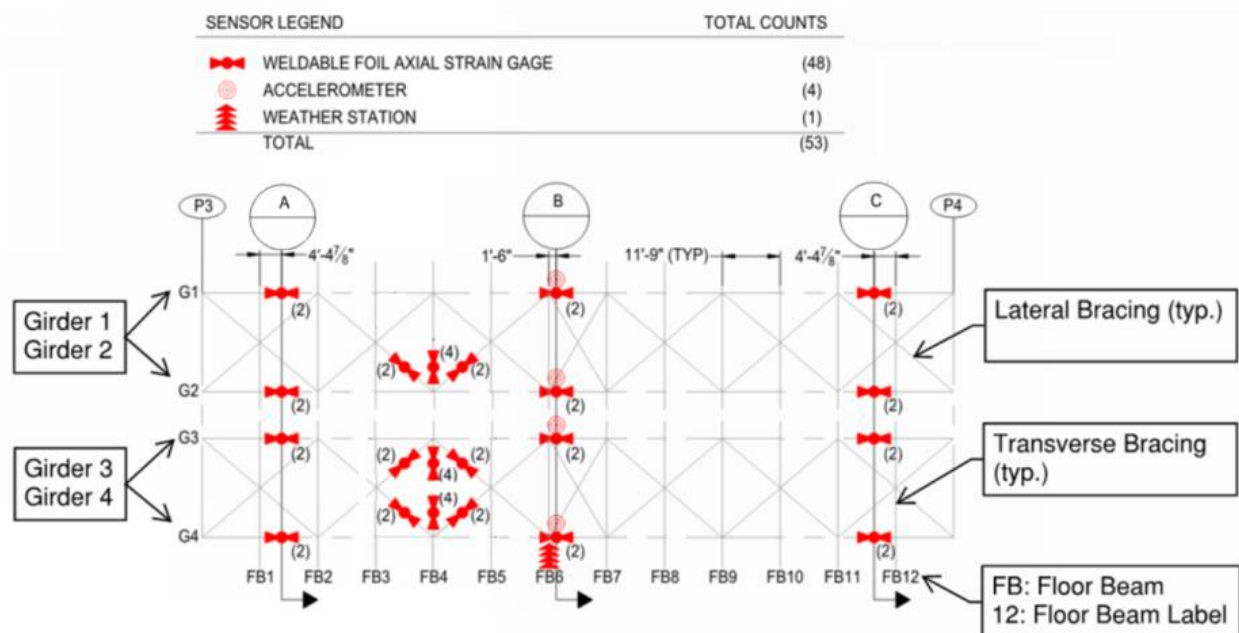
Plan view of span 4, showing the instrumentation layout
